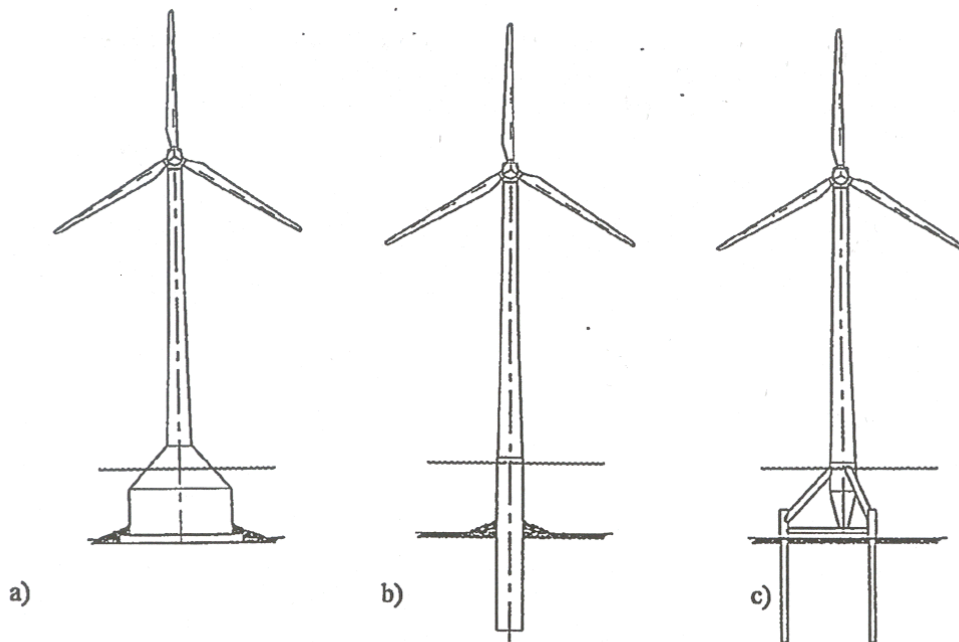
The three basic concepts as envisioned at project start. a) Concrete gravity foundation, b) Steel mono pile and c) Steel tripod
